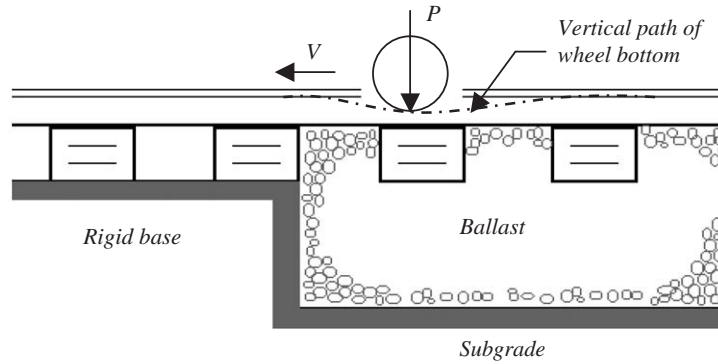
Abutment of open deck bridge or tunnel ends in track transition.
